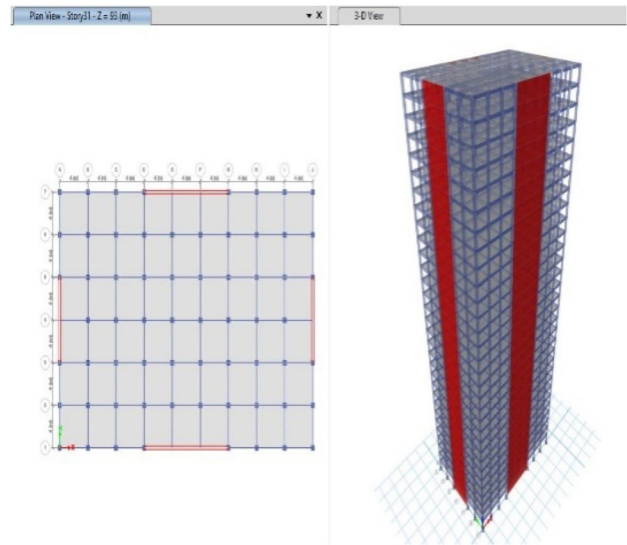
Model-5: Buildings with shear wall located at all four edges
